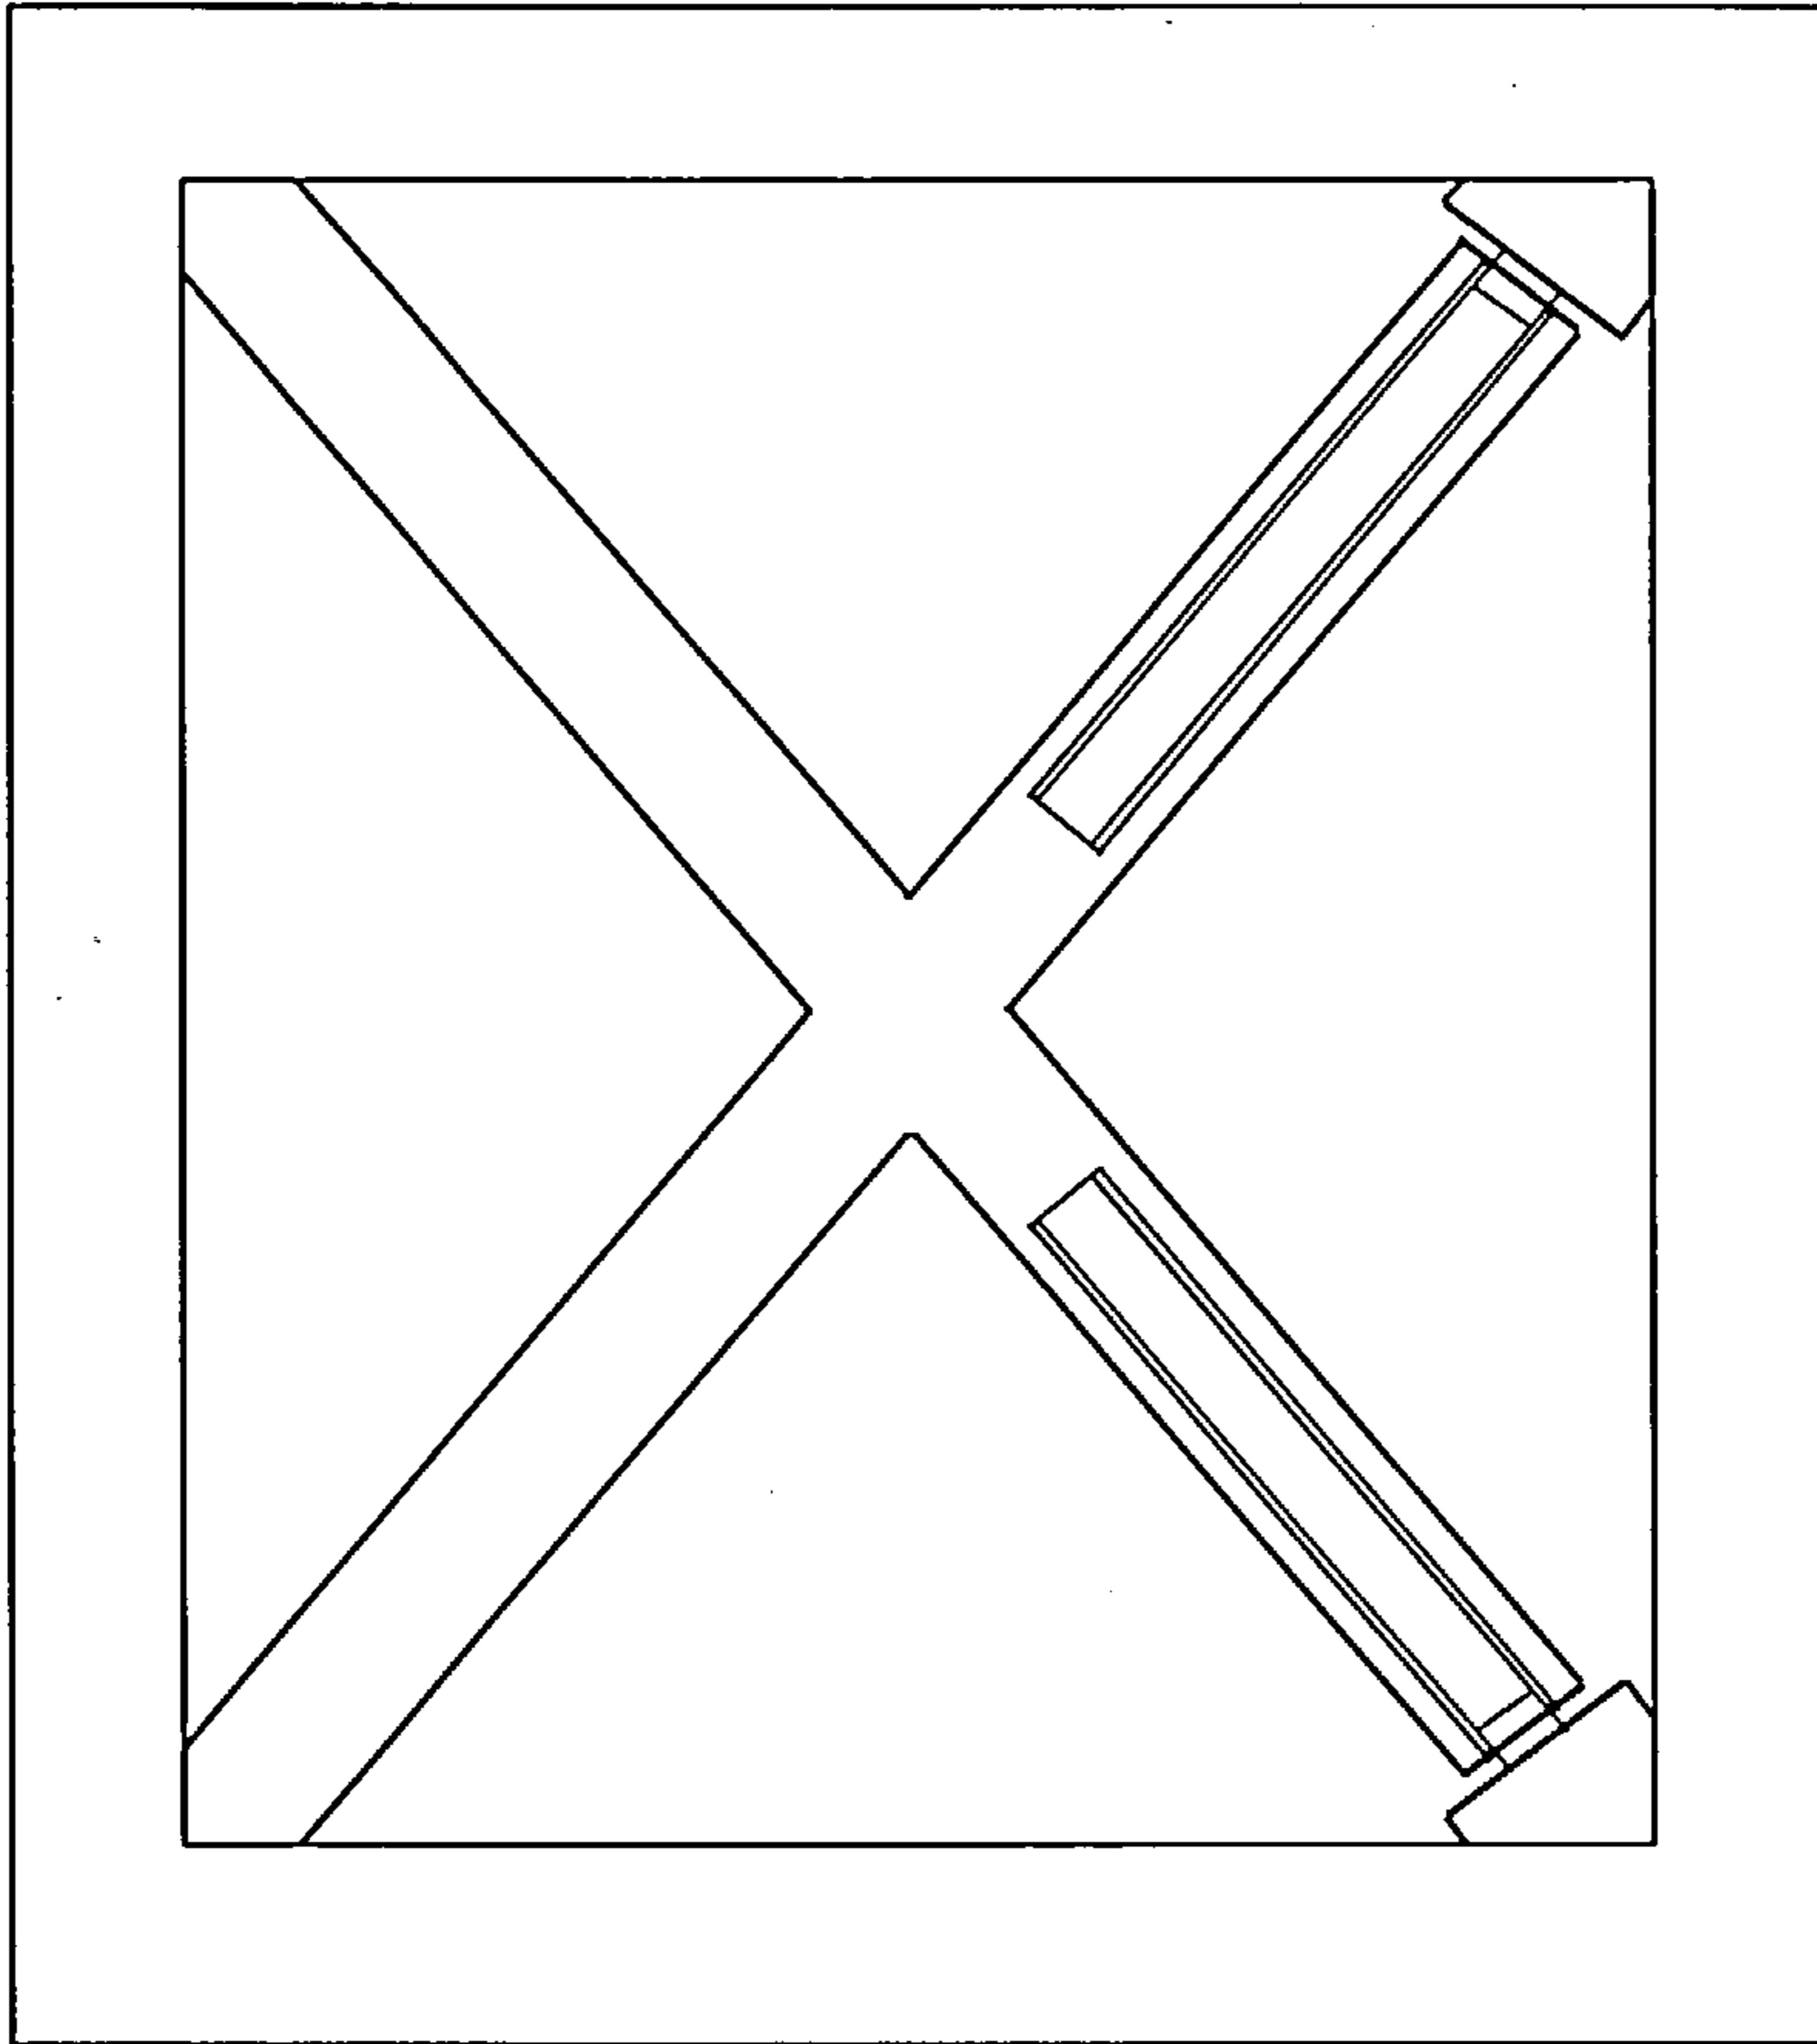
Precast concrete bracing with steel insert absorbers
